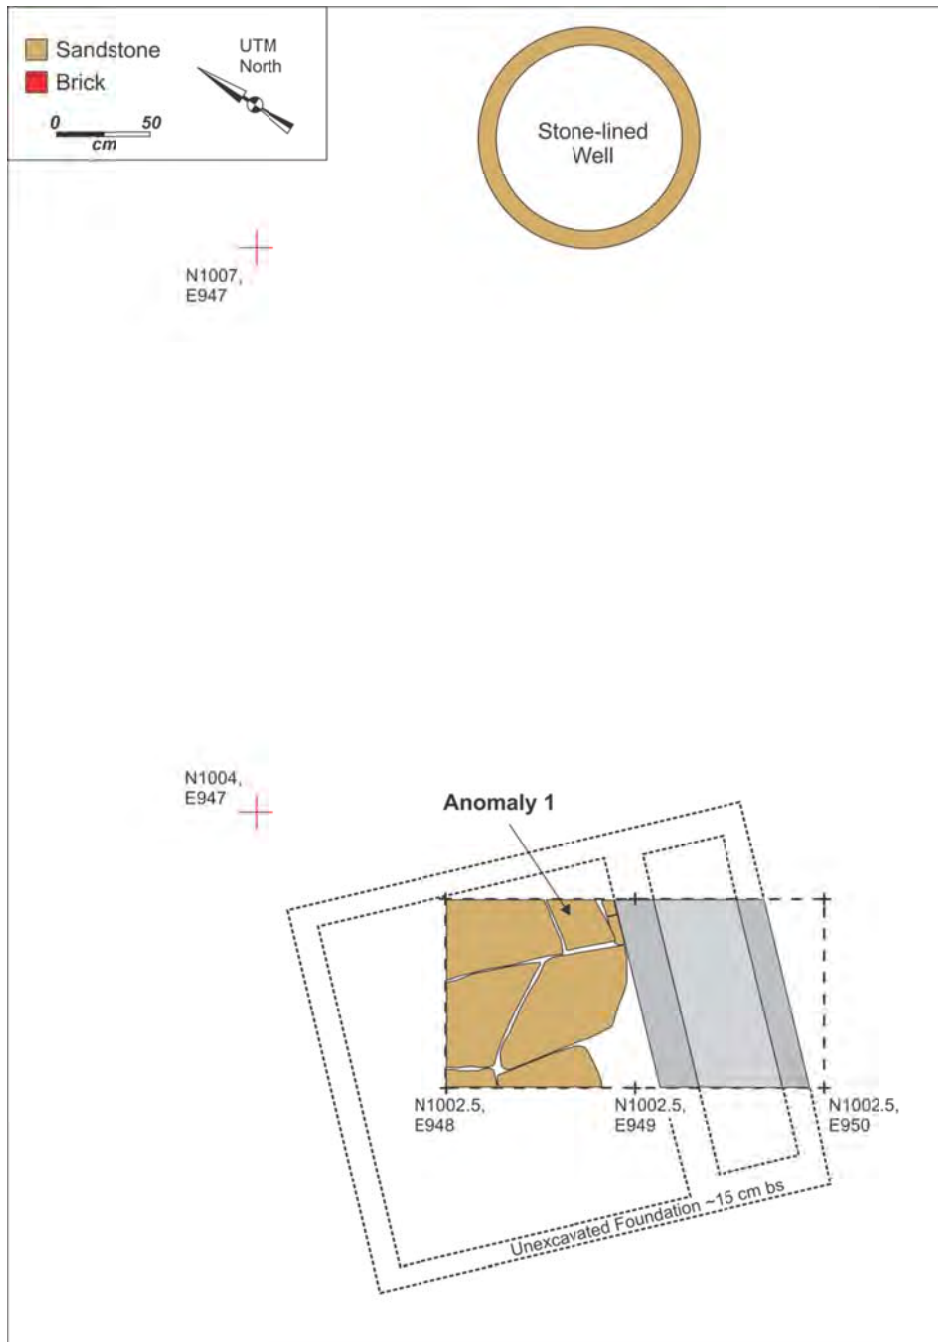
Illustration of pump house foundation (Anomaly #1) and well adjacent to Structure #2 at Stockdale Road Dairy.
